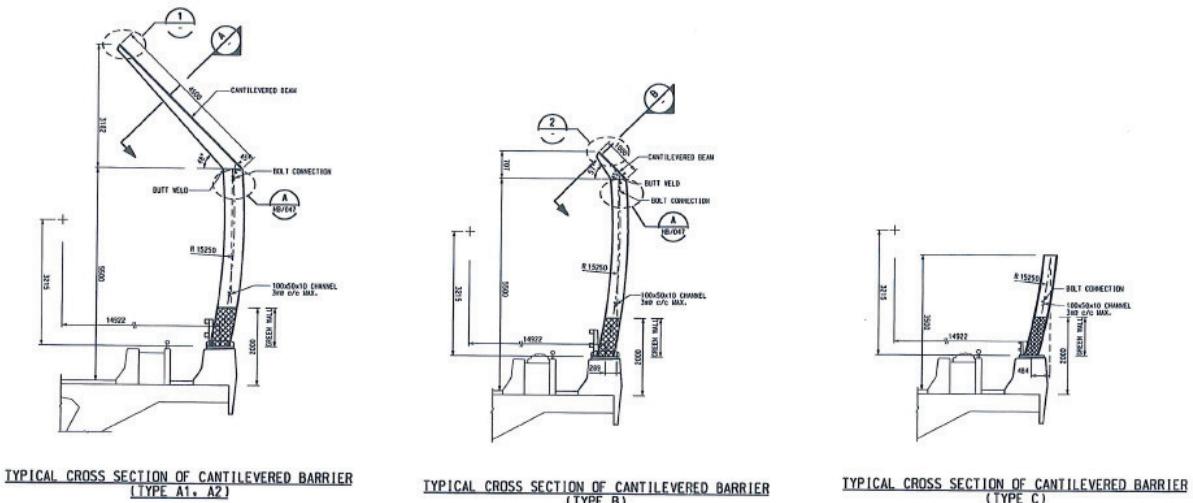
Sections of 3 Types of Cantilever Noise Barrier
